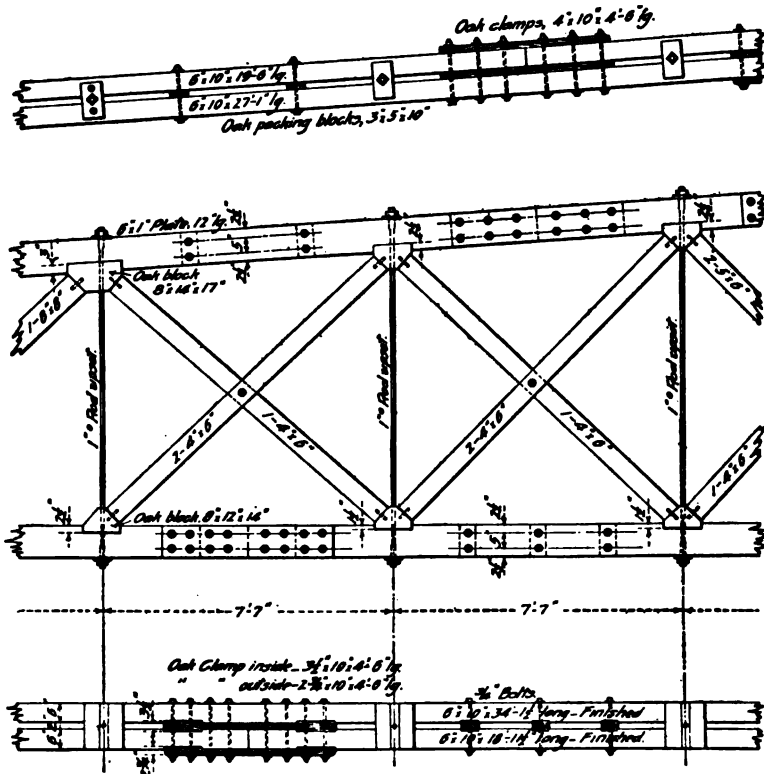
Part of Roof Truss for Freight-car Shops of Canadian Pacific Railway at Montreal.
